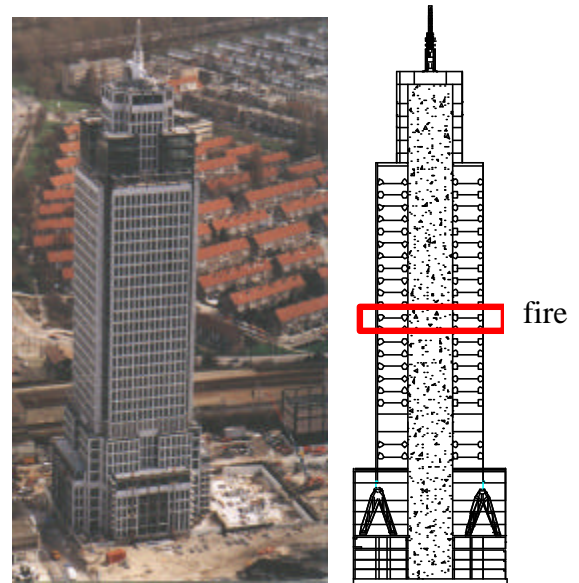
Photo of the Rembrandt Tower in Amsterdam and the vertical cross section with the fire exposed structure.
